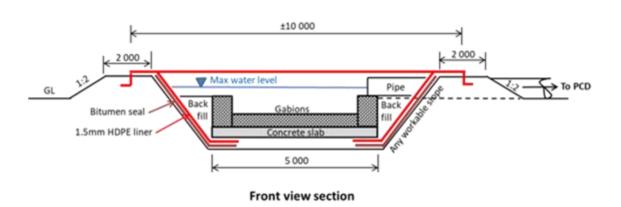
Sealing arrangements for the silt trap The Stockpile areas
